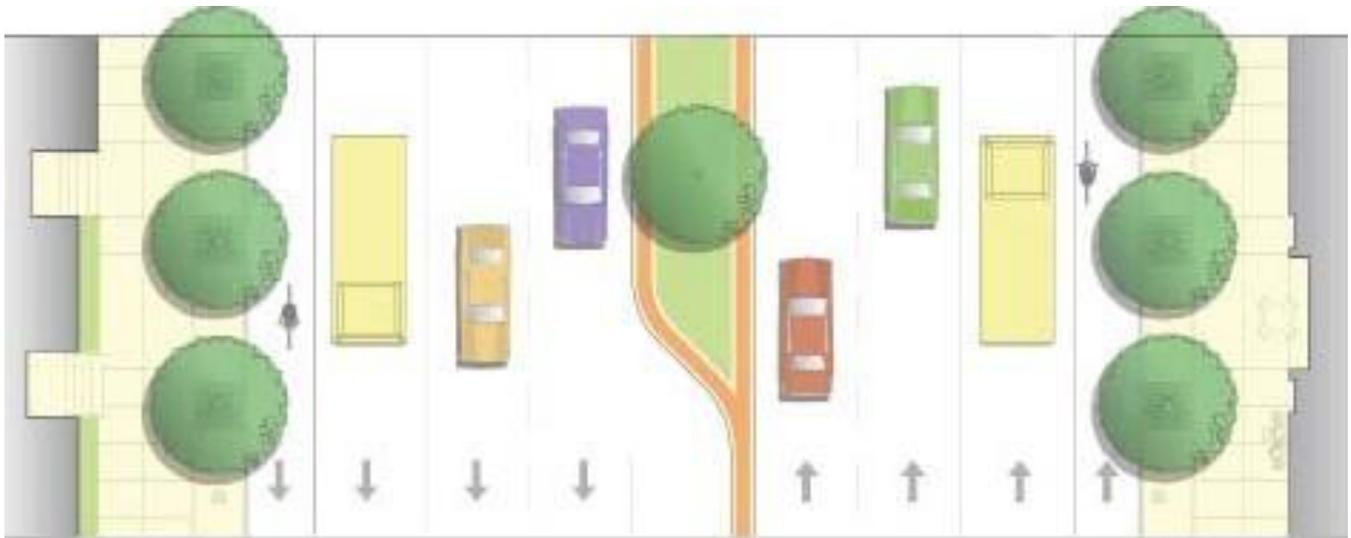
Watt Avenue Concept Plan, I-80 to Peacekeeper Way (approximate)
